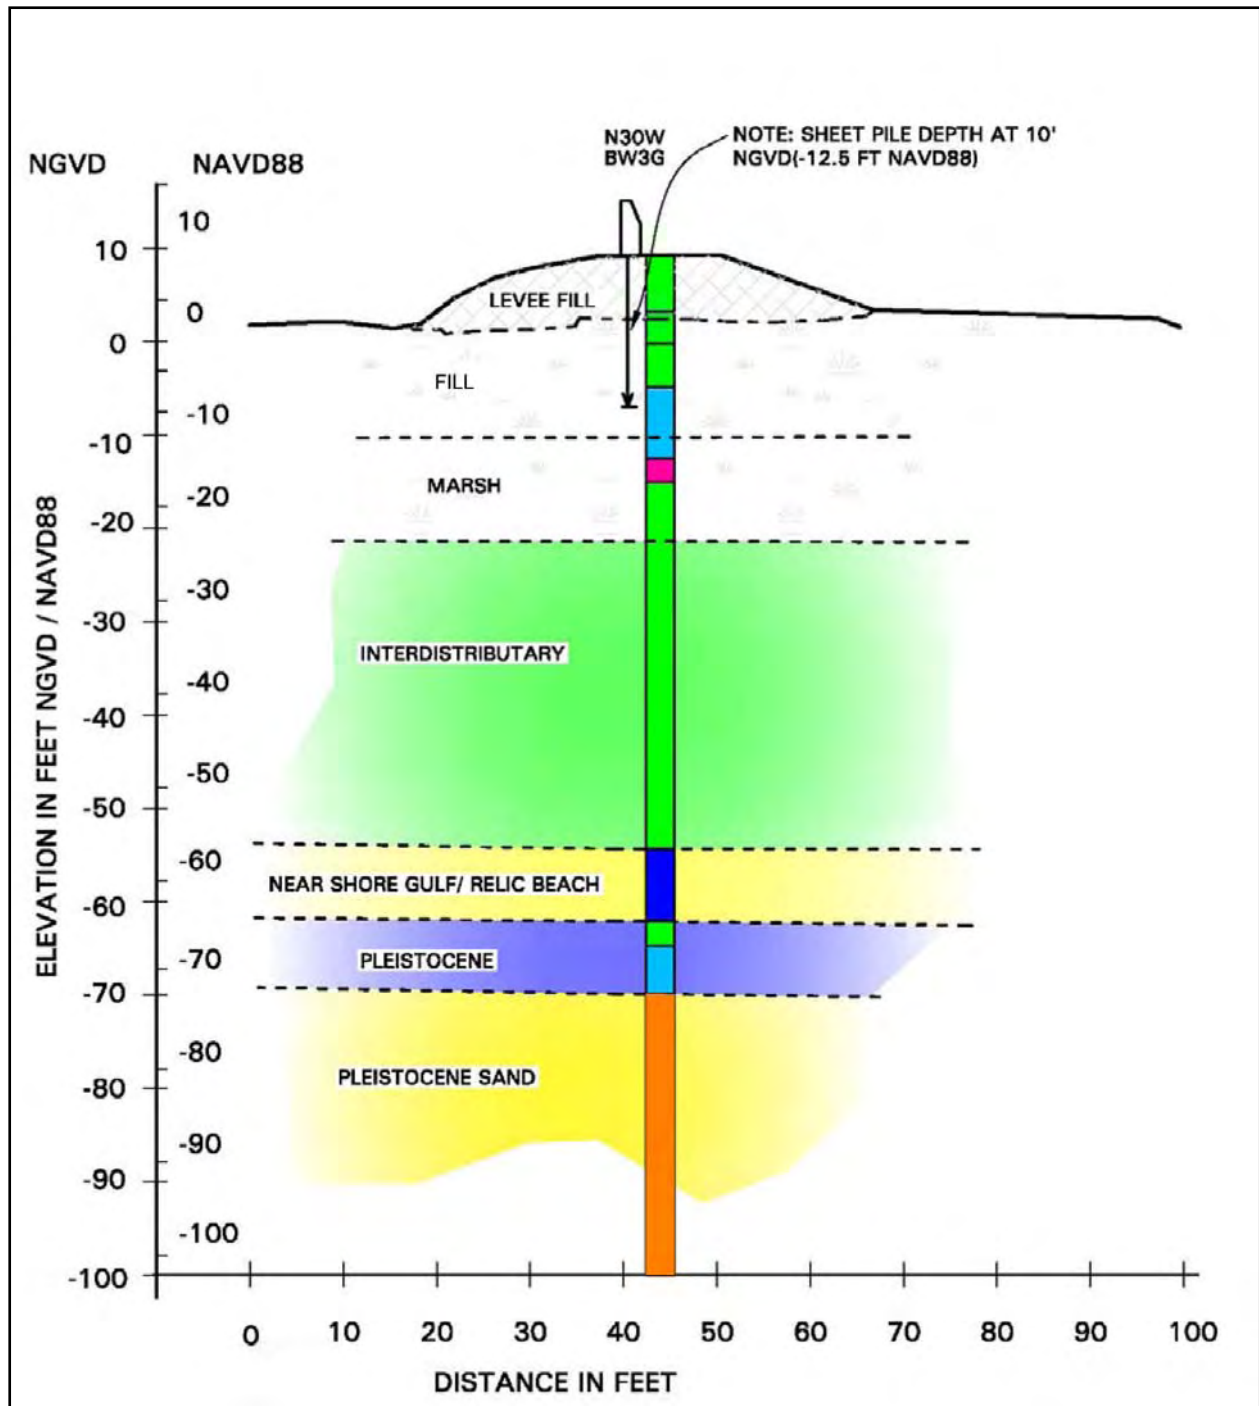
IHNC – West Bank – Cross Section of North Breach
